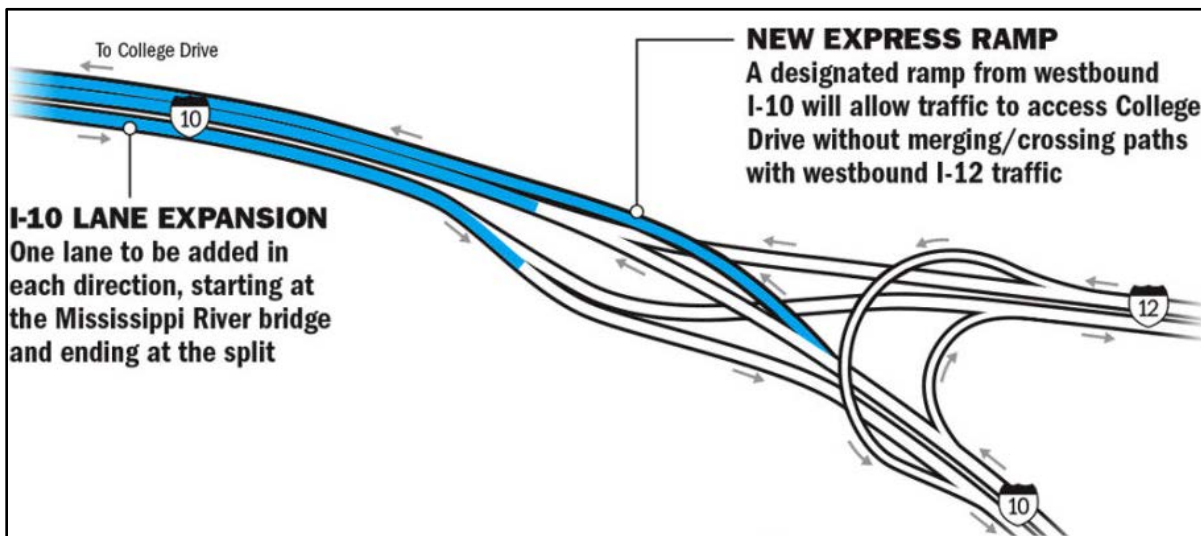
Stage-3: Redesign and reconstruction of I-10/I-12 Split Interchange (17).
